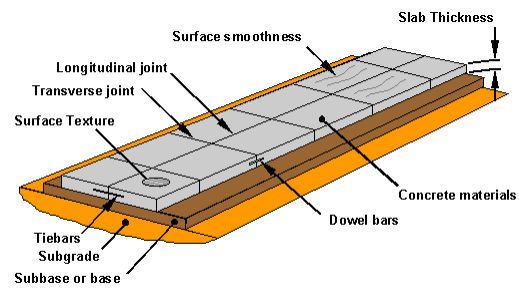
Typical section of a rigid pavement (Concrete Pavement Fundamentals, 2022)
